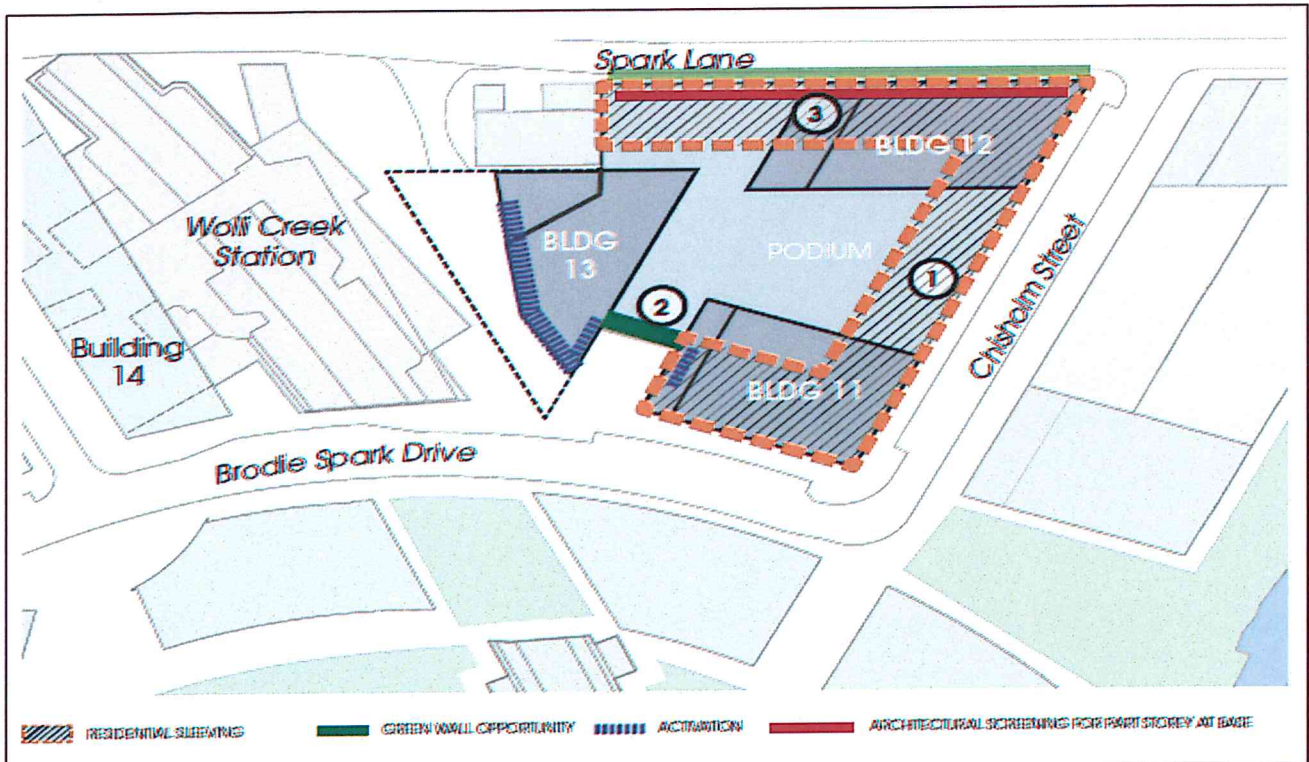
Proposed treatment of above ground car parking for Buildings 11-13.
